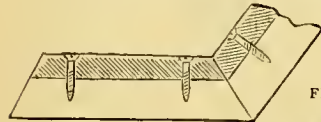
PLAN OF FRONT AND PART OF ONE SIDE OF SILL SHOWING ATTACHMENT TO CASING.
